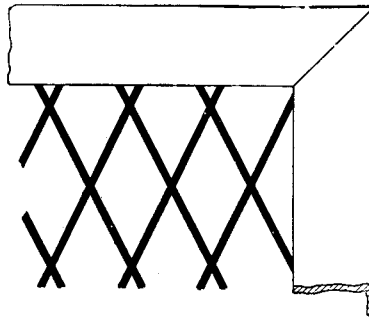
shows 1 x 2 inch diamond mesh of No. 13 gauge expanded metal.
